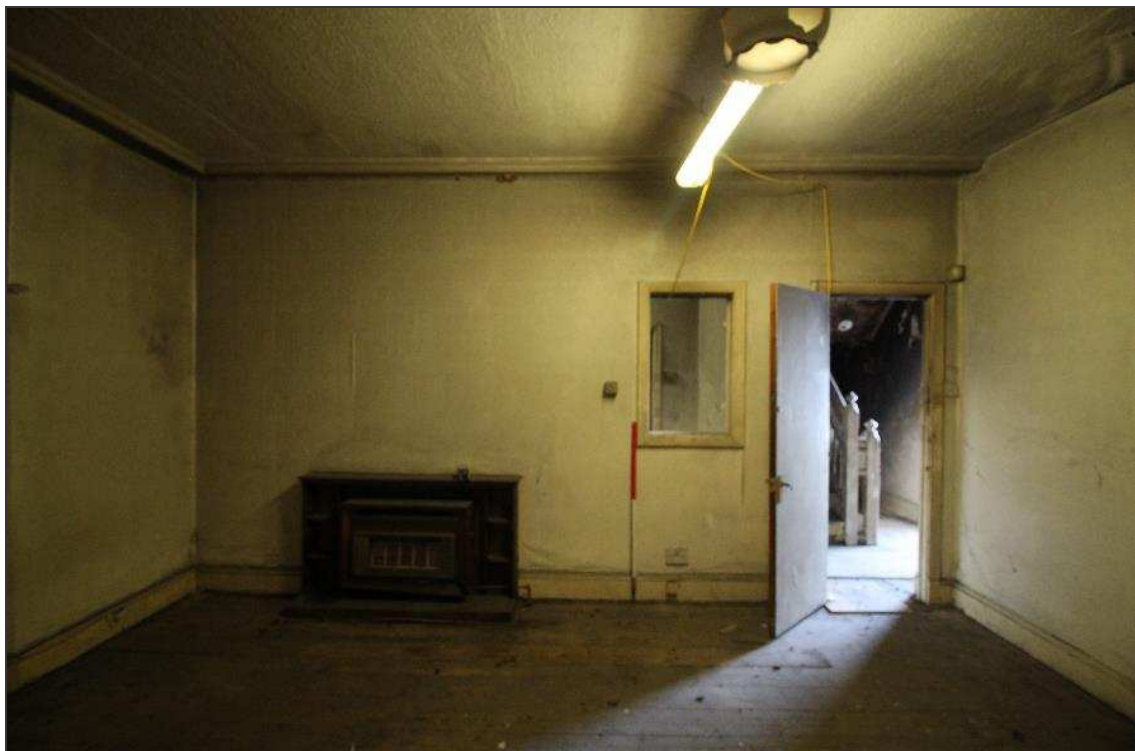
Southern wall of the second room showing the doorway, the gas fire and the hatch between the first and second rooms
